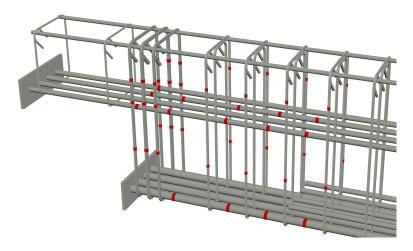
Strain gauges distribution on reinforcing bars (specimen DEB-1.6).
